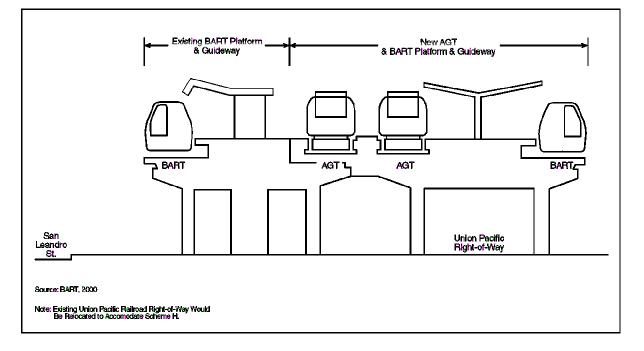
Coliseum AGT Station Scheme H Cross-Section
